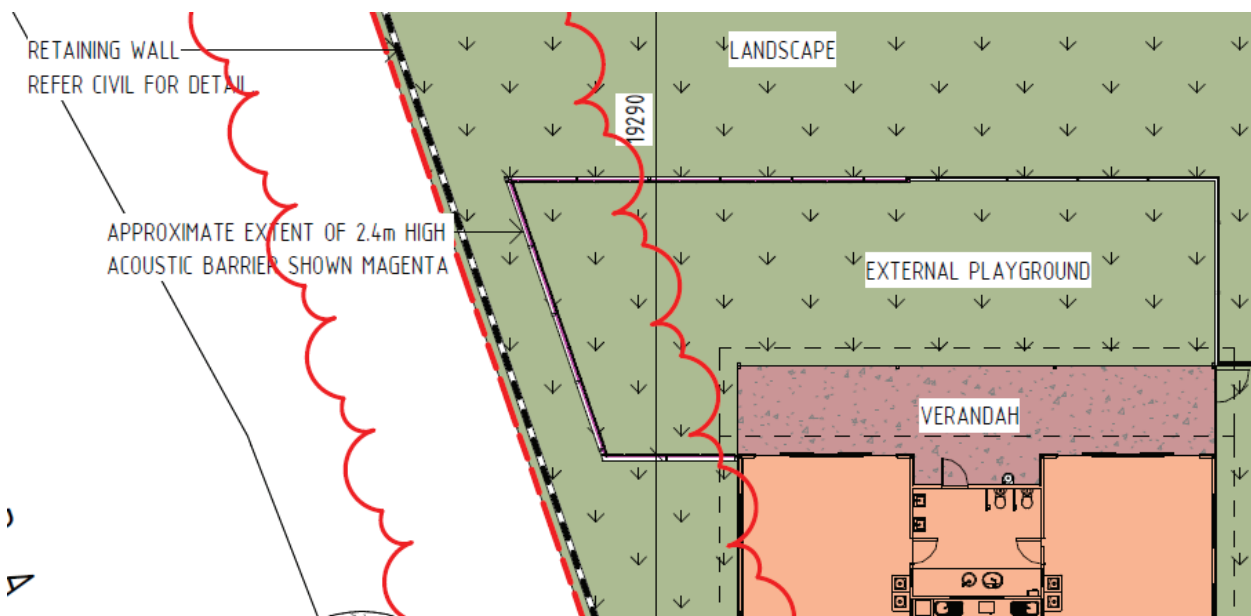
Location of proposed 2.4 m High Acoustic Barrier
